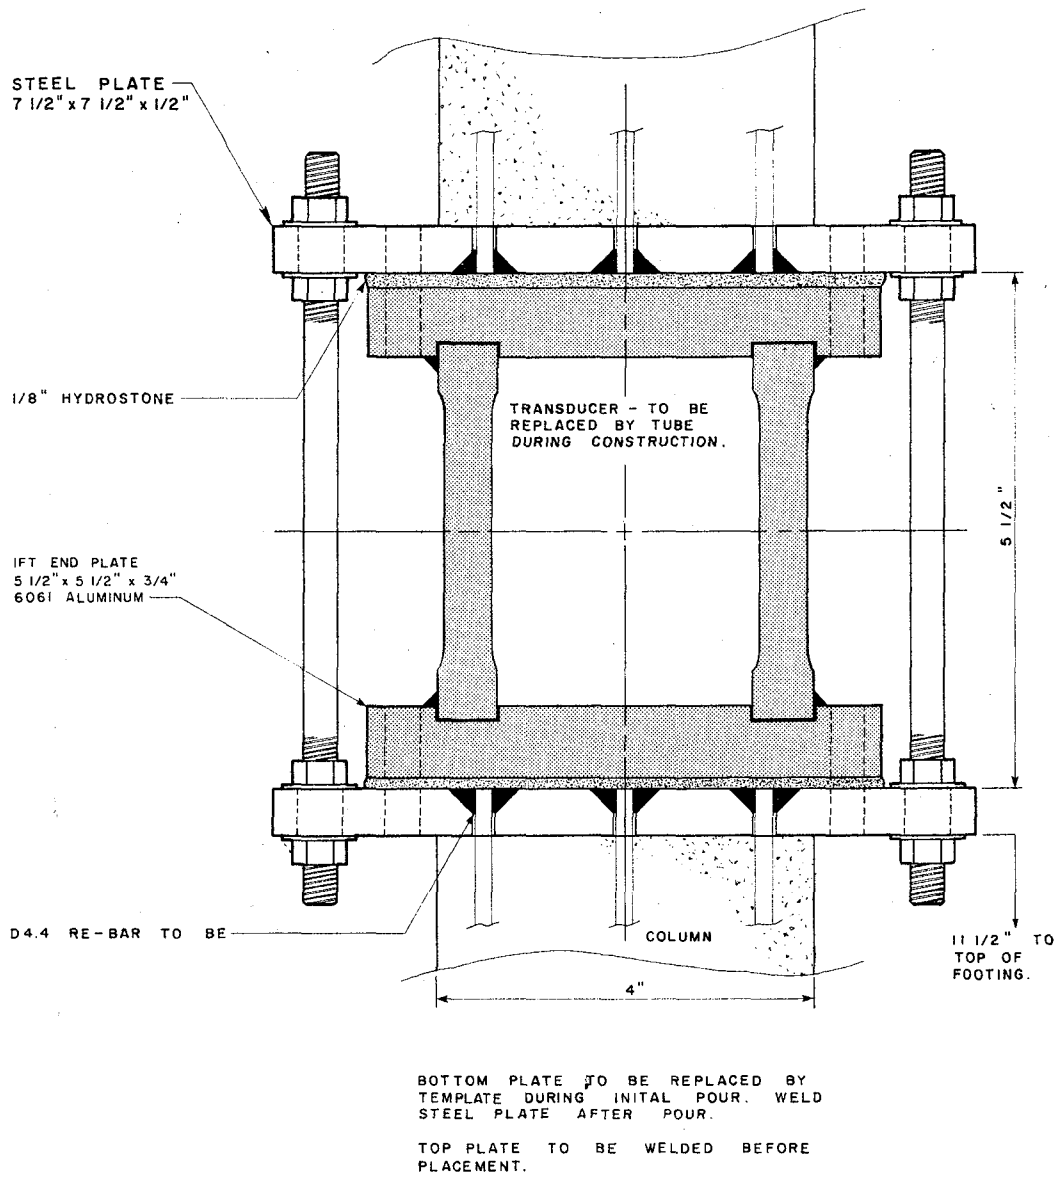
(c) INTERNAL FORCE TRANSDUCER INSTALLATION
